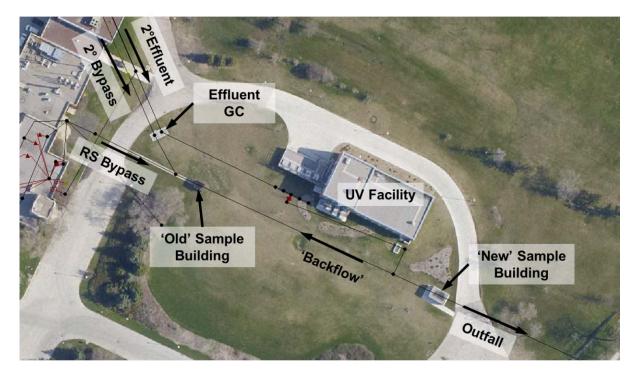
Site Plan of Effluent Conduit Inspection
